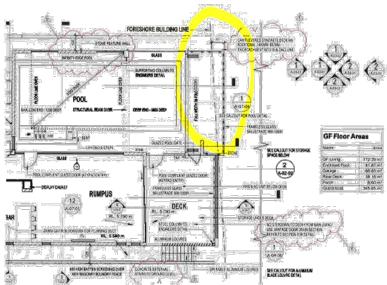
Proposed ground floor modification plan (revised deck structure highlighted vellow)
